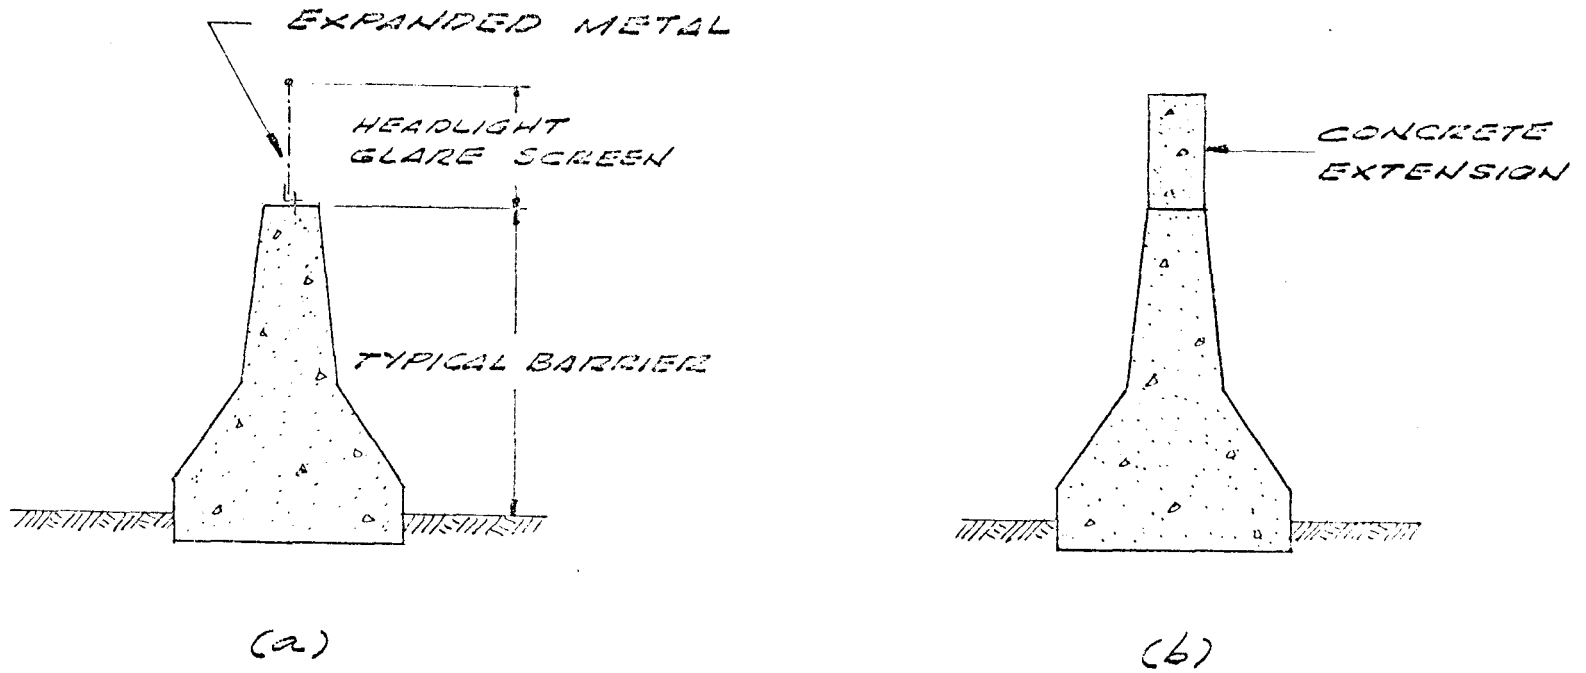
USE OF CONCRETE BARRIER FOR GLARE SCREENING
